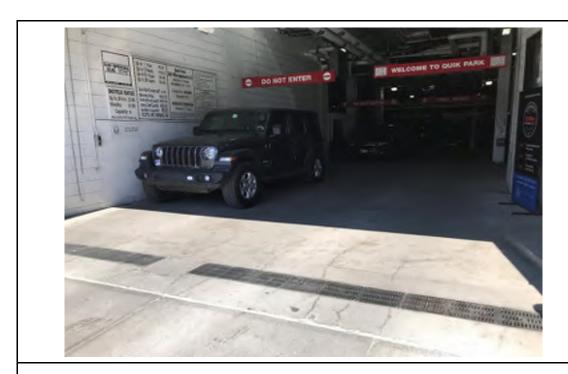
Subgrade parking garage entrance on 2nd Street, facing north. 30 March 2021.
